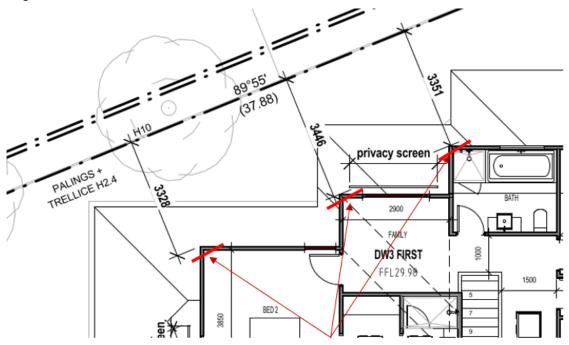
Northern first floor plan of Dwelling 3 showing staggered setback, with small areas of setback noncompliance shown on each corner (red)
